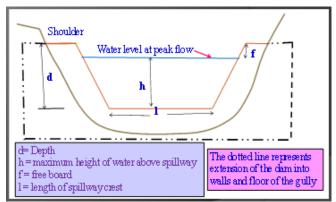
shows the trapezoidal/parabolic shaped spillway Source: - Belayneh Adugna, 2012
